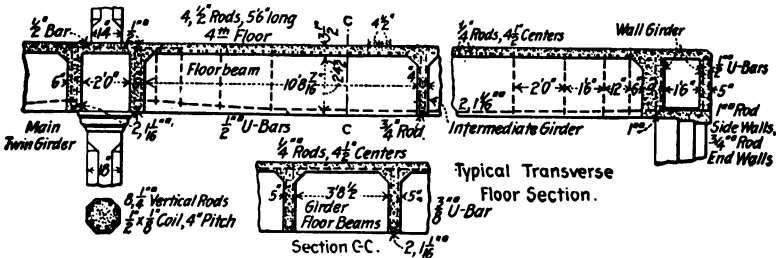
Floor for Pacific Borax Co.'s Factory.
